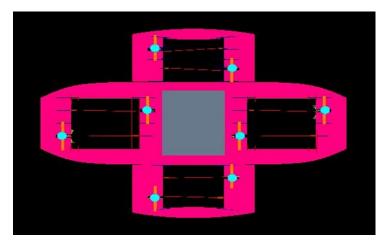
Cutting Construction Profile 7000 mm form centerline
